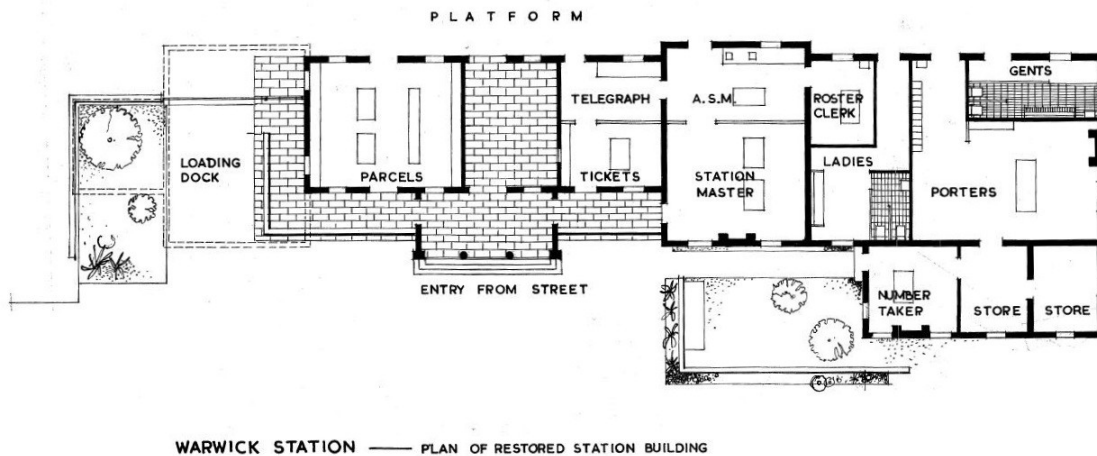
Alterations to Warwick passenger station plan after 1964 fire. Drawing dated 1967. Source: QLD Rail drawing no. K06844.
